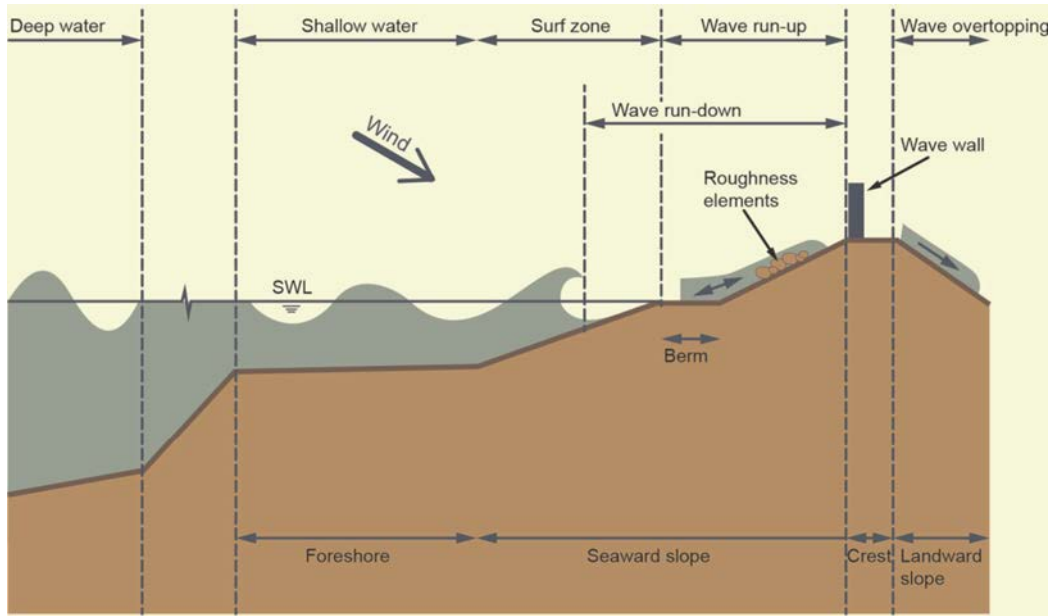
Typical cross-section for sea dikes and embankment seawalls with definition of wave run-up and overtopping. Source: EurOtop (2016), modified
